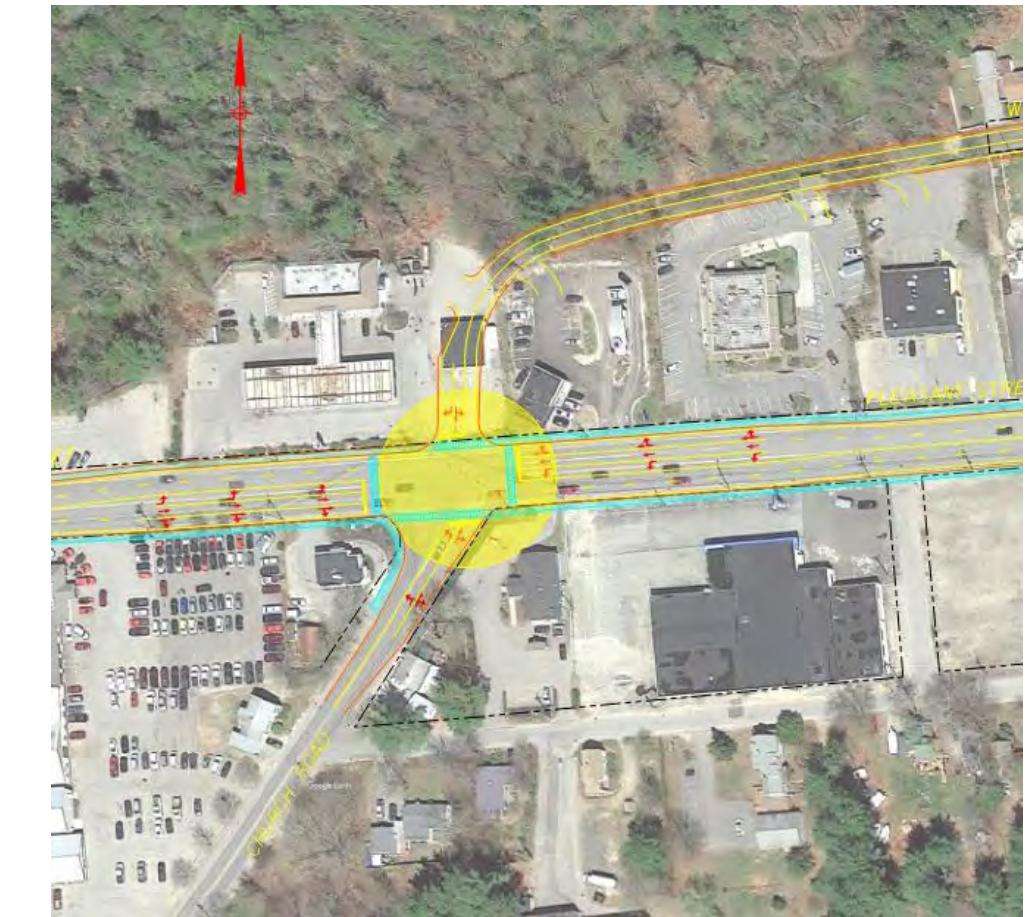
Pleasant Street/Church Road Roundabout Coverage Area
